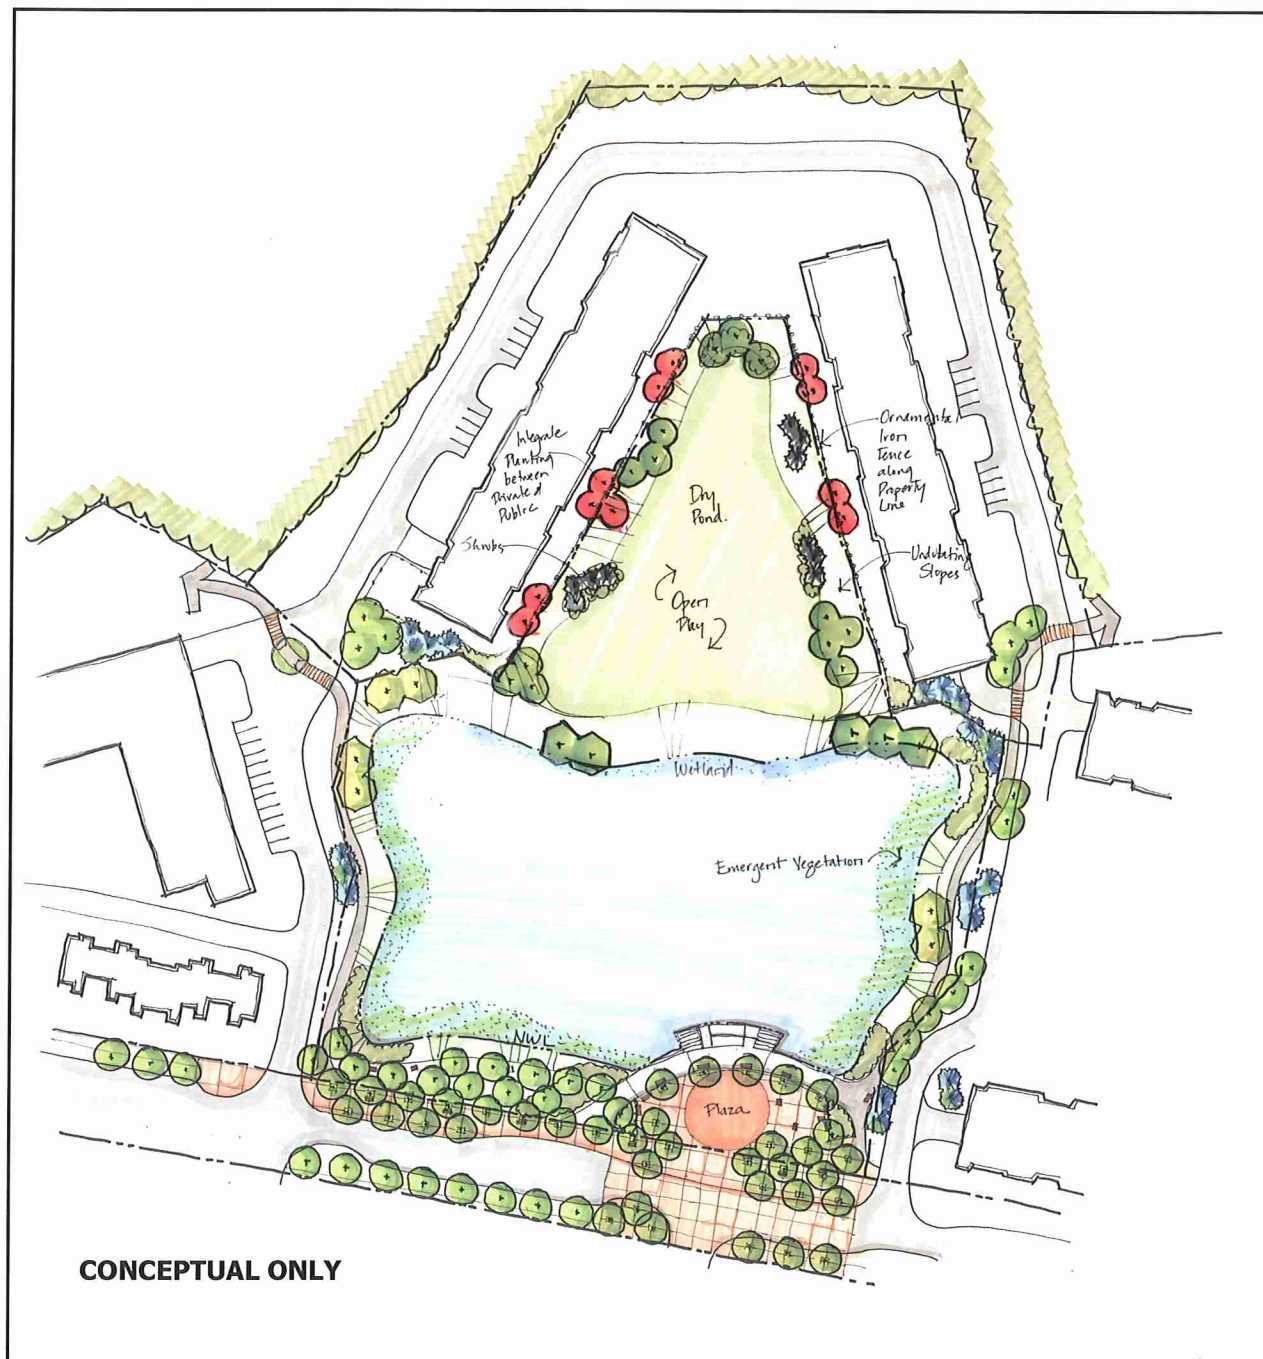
CONSTRUCTED WETLAND CONCEPT PLAN
